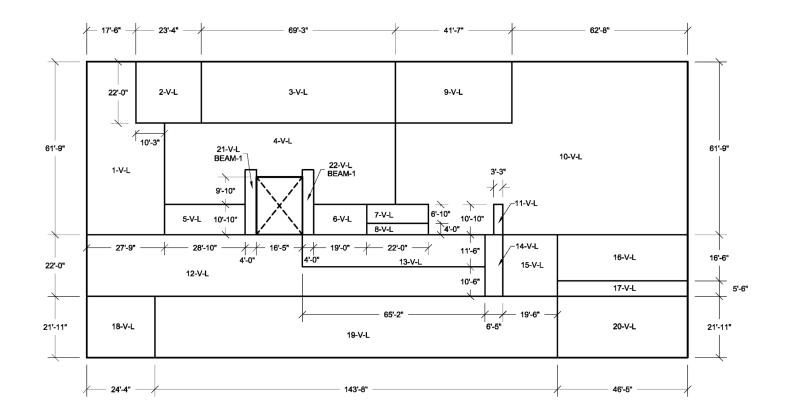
H.3-16 South Wall Looking North Vertical Reinforcement Zones Far Side Face
